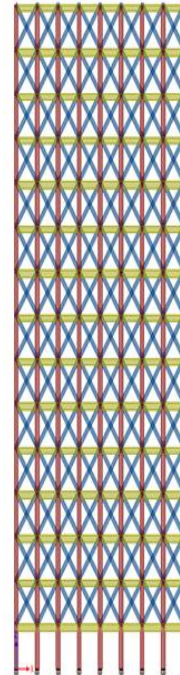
Steel Framed model of building with Exterior X-Brace
